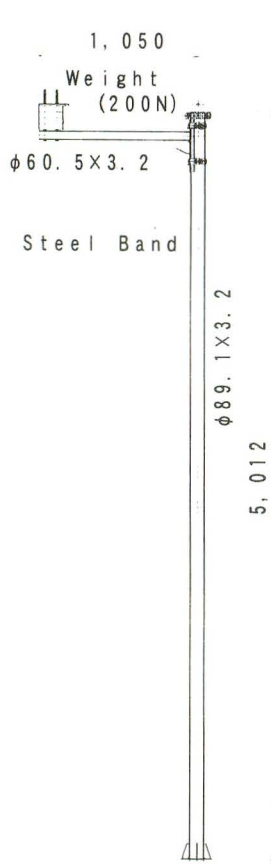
Geometrical configurations of the specimen (unit: mm)
